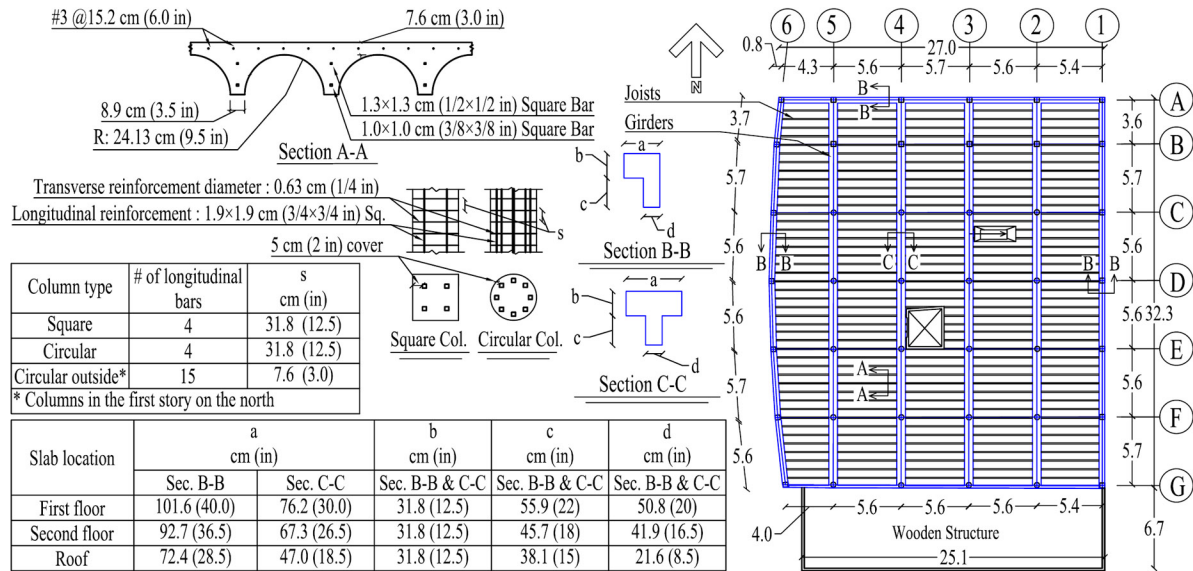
Second-floor plan view and RC member detailing (units are in meters unless stated otherwise)
